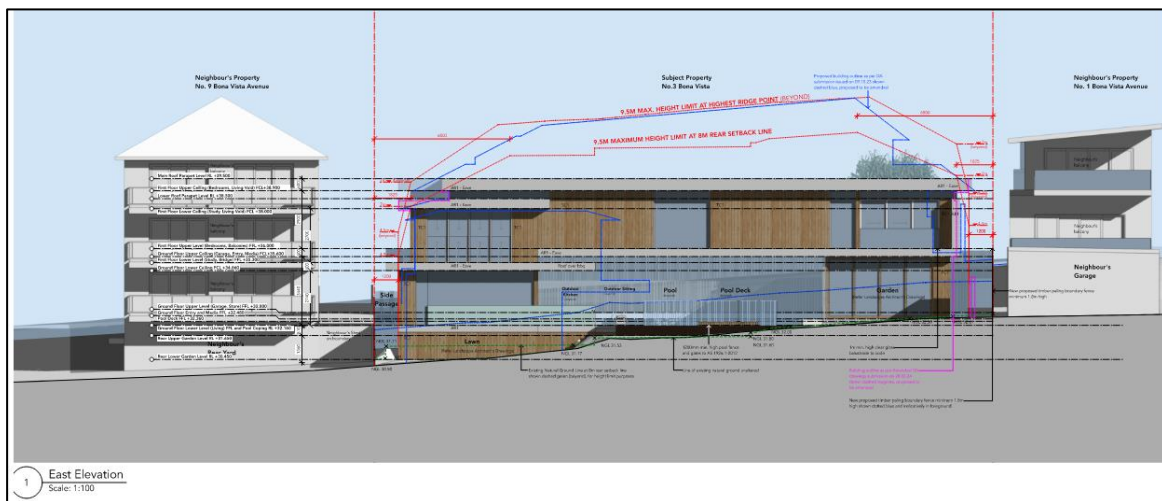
Amended Proposal at subject site after Councils RFI - East Elevation (appearance from the rear) (Source: Dominic Levene)
